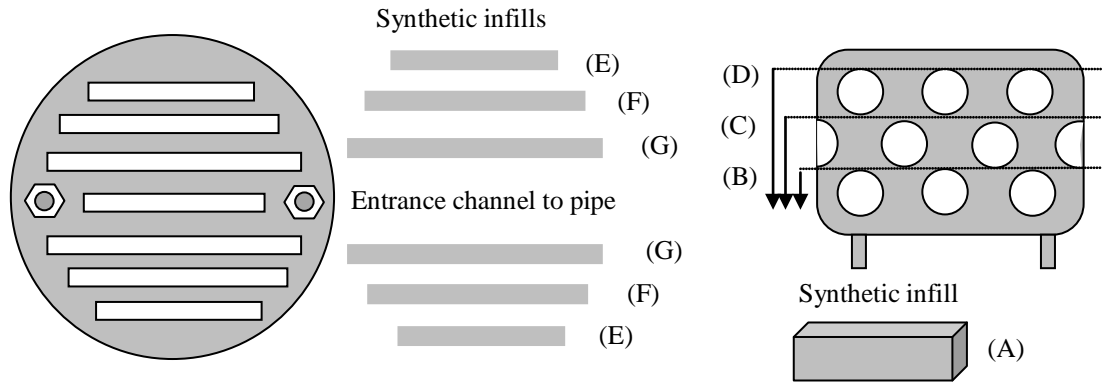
Outlet A, baffle: Plan and elevation.
